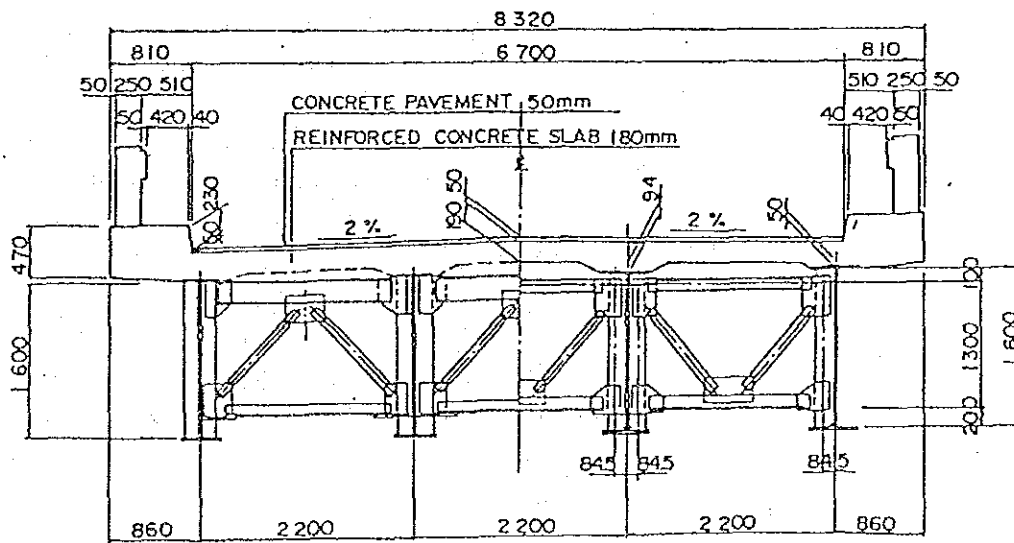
PLATE GIRDER (BUILD UP BEAM) (SPAN: 35m)
